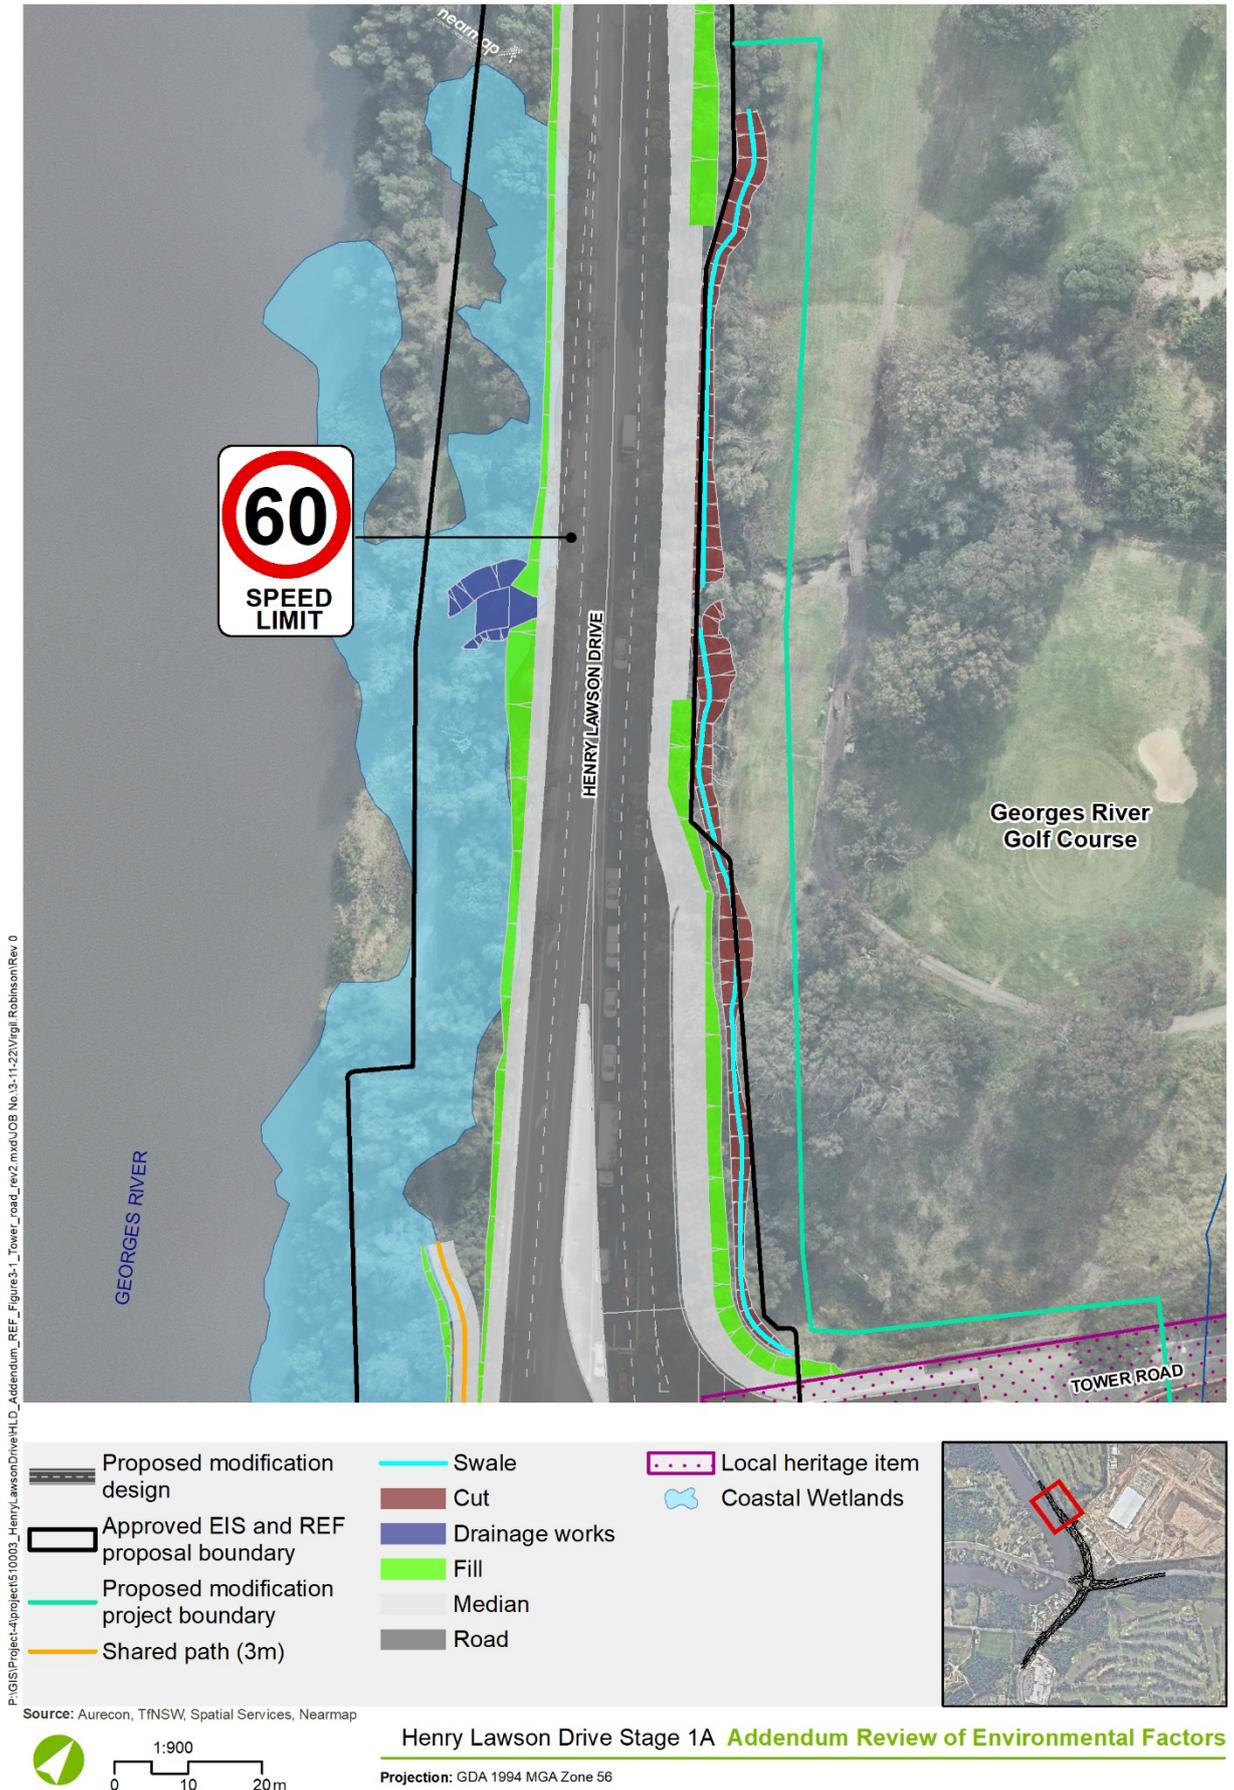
Additional drainage and earthworks on the Georges River Golf Course north of Tower Road
